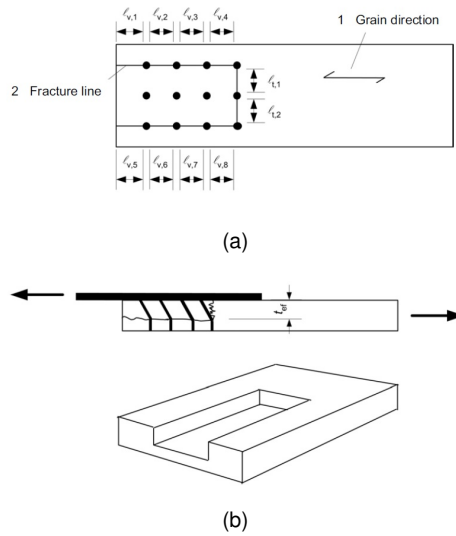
Brittle timber failure modes [1] - a) block shear failure - b) plug shear failure.
